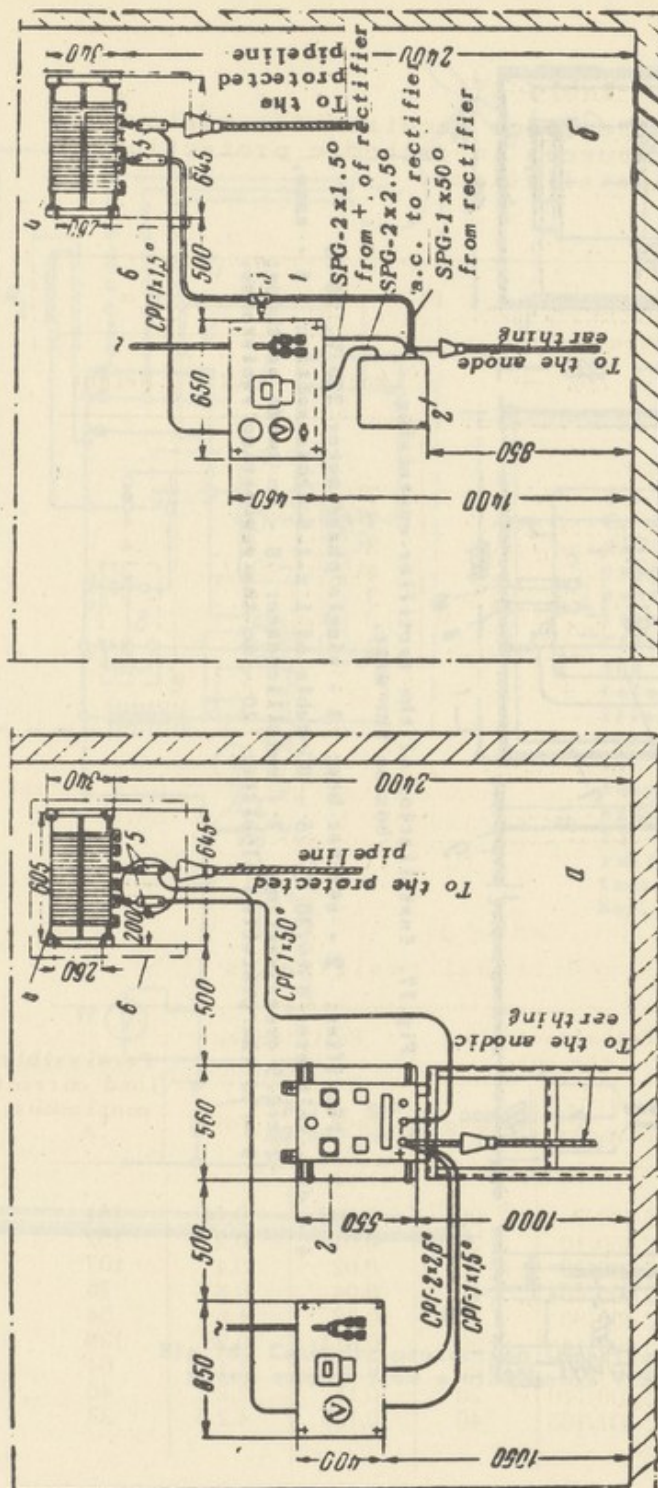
Example of the layout of the equipment and installation drawing of current sources for cathodic protection fitted in a building.
